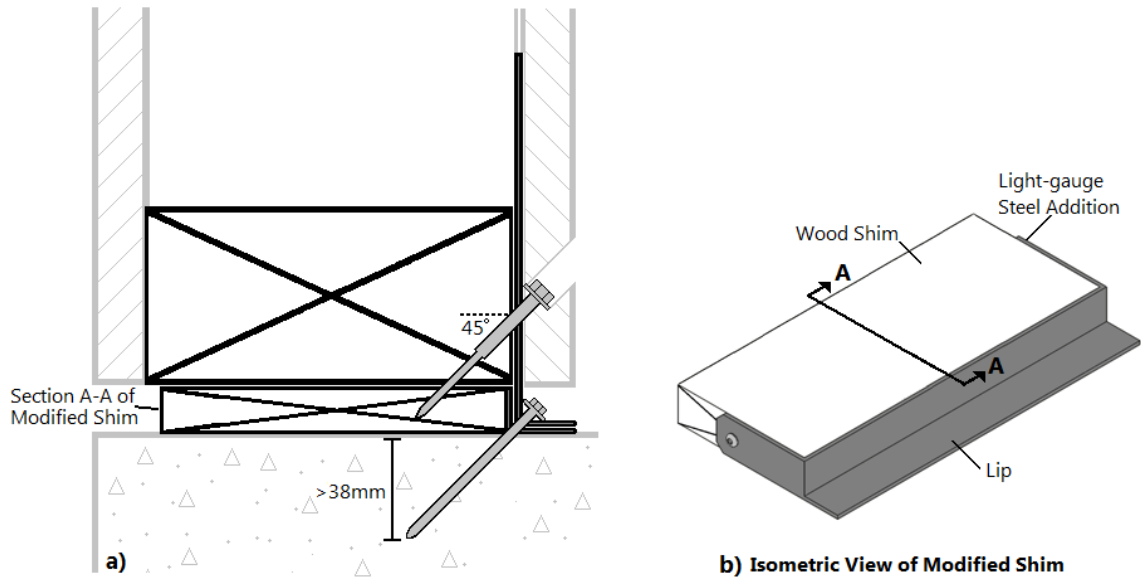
Modified Bottom Connection with Shim: (a) Cross Section; (b) Shim.
